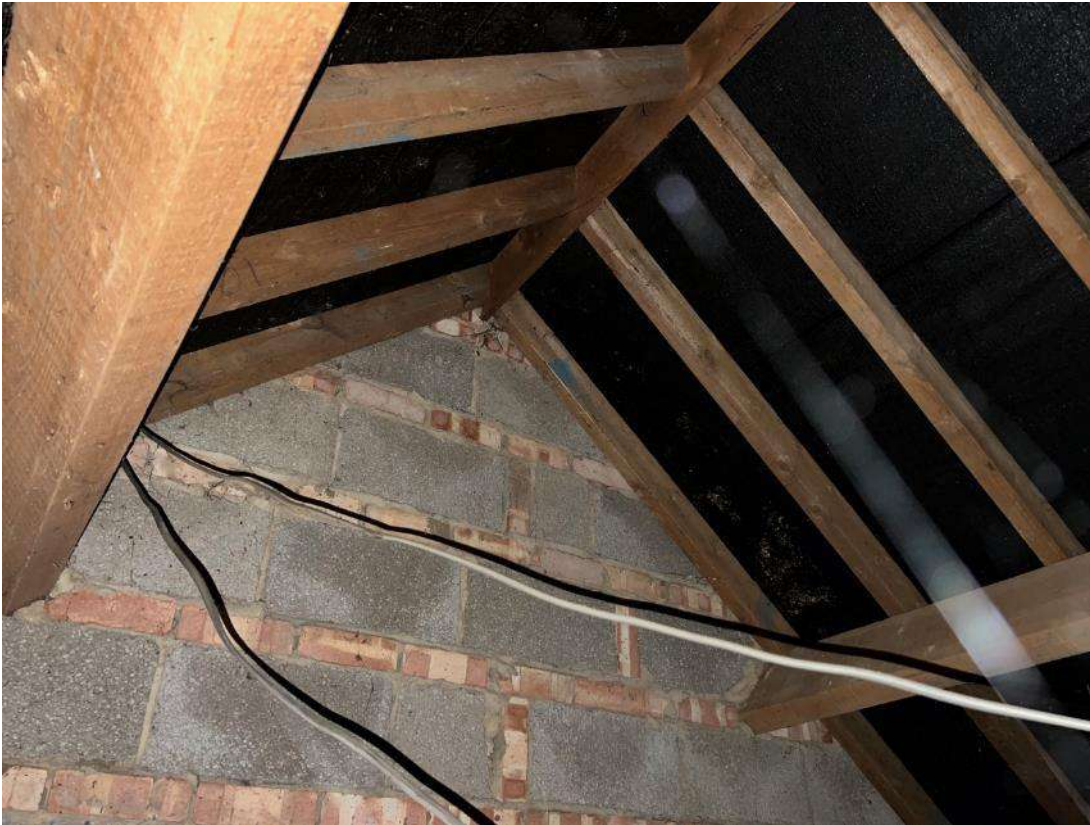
Building section 1. Shows modern timber work, block work and roof lined with felt. North end of roof space.
